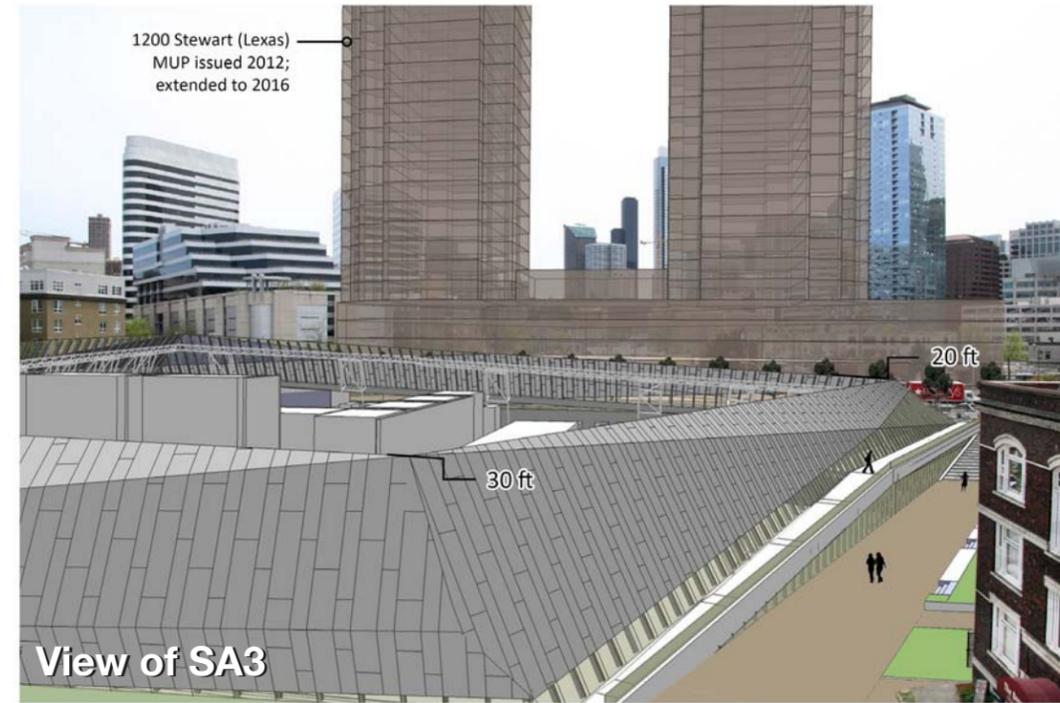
Building View 3 of Proposed Substation from The Brewster
